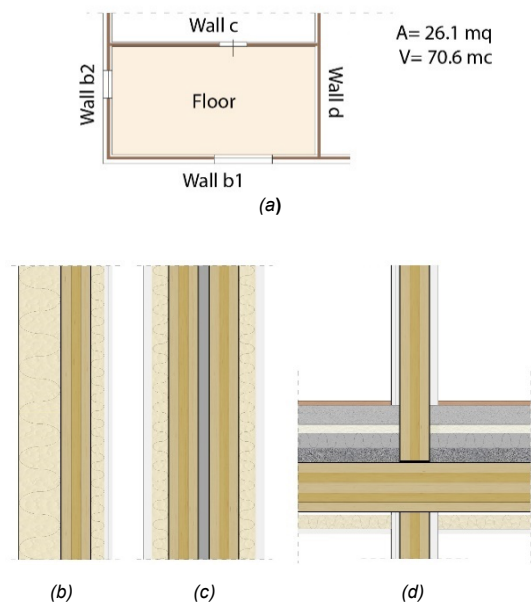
Distribution of the elements in the plan (a) and construction elements: external wall type b (b), internal wall type d (c) and detail internal wall type c - floor (d)
